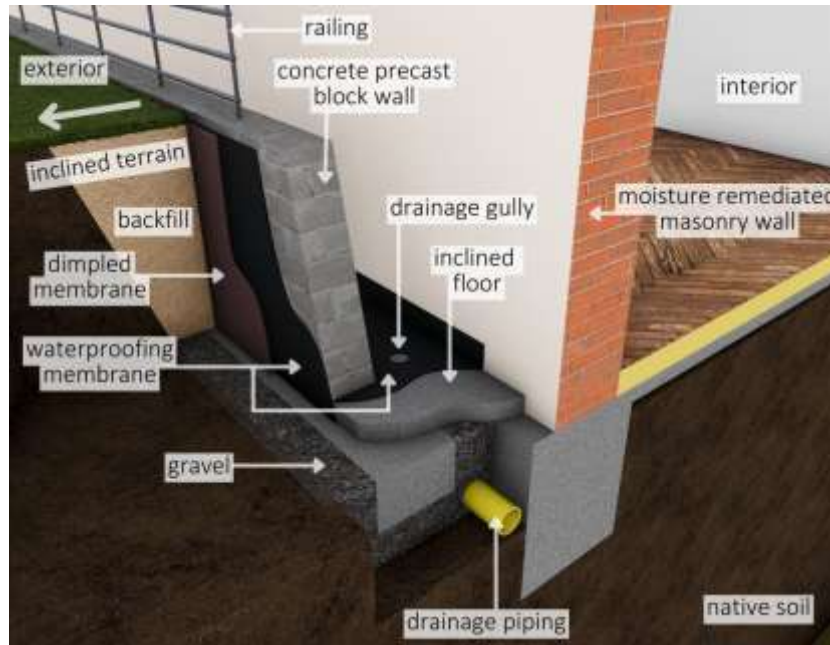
Open wall cavity below ground level for the full height of the exterior wall.
